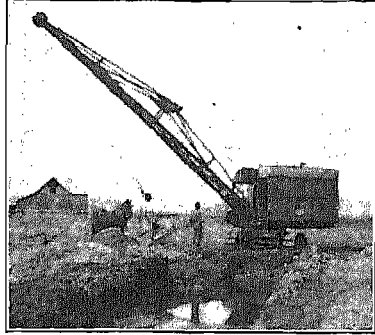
Drag-line excavator in operation constructing an open drain. (Photograph by author.)
